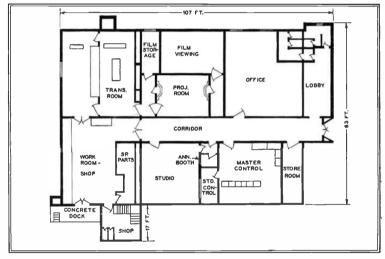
THIS ONE-FLOOR BUILDING HOUSES ALL WDAF-TV FACILITIES, INCLUDING A LIVE STUDIO
